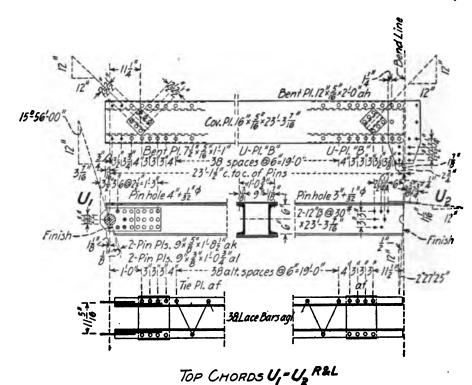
DETAIL SHOP PLAN OF TOP CHORD.
